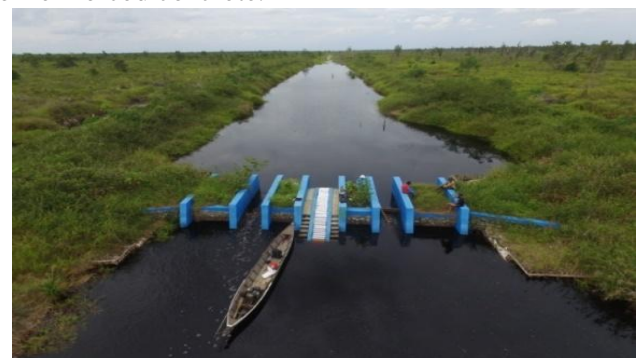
Permanent canal-blocking structure of reinforced concrete
